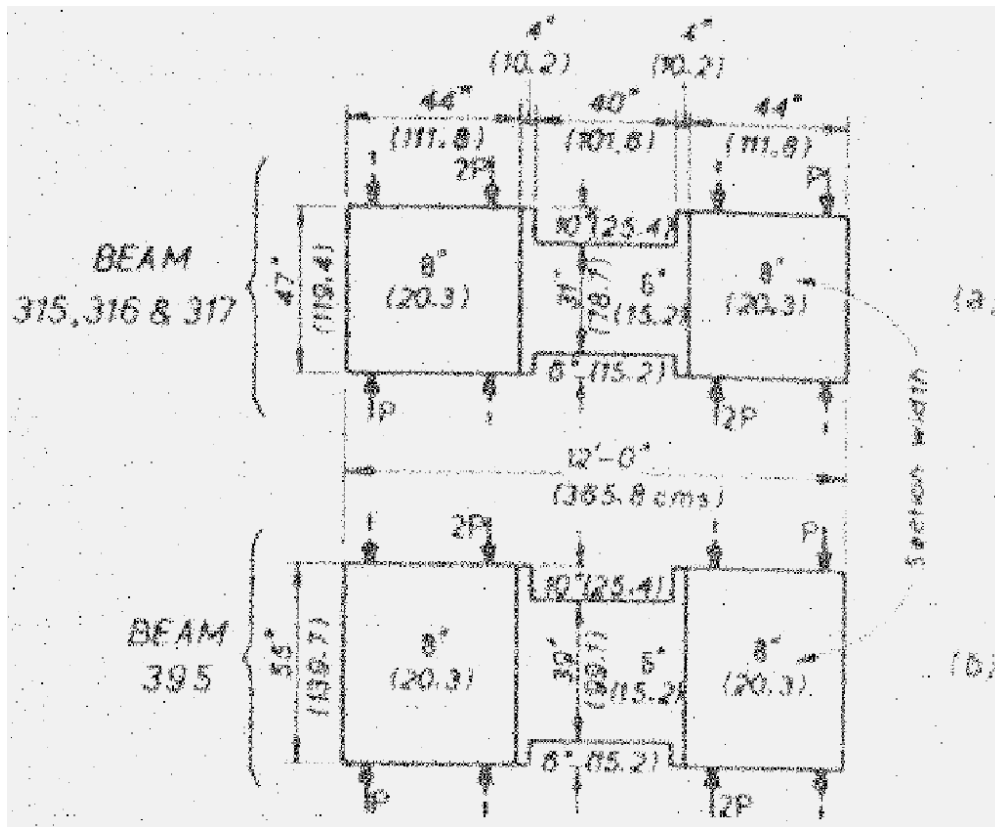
Loading Pattern and Principal Dimensions of Test Specimen (Paulay and Binney, 1974)
